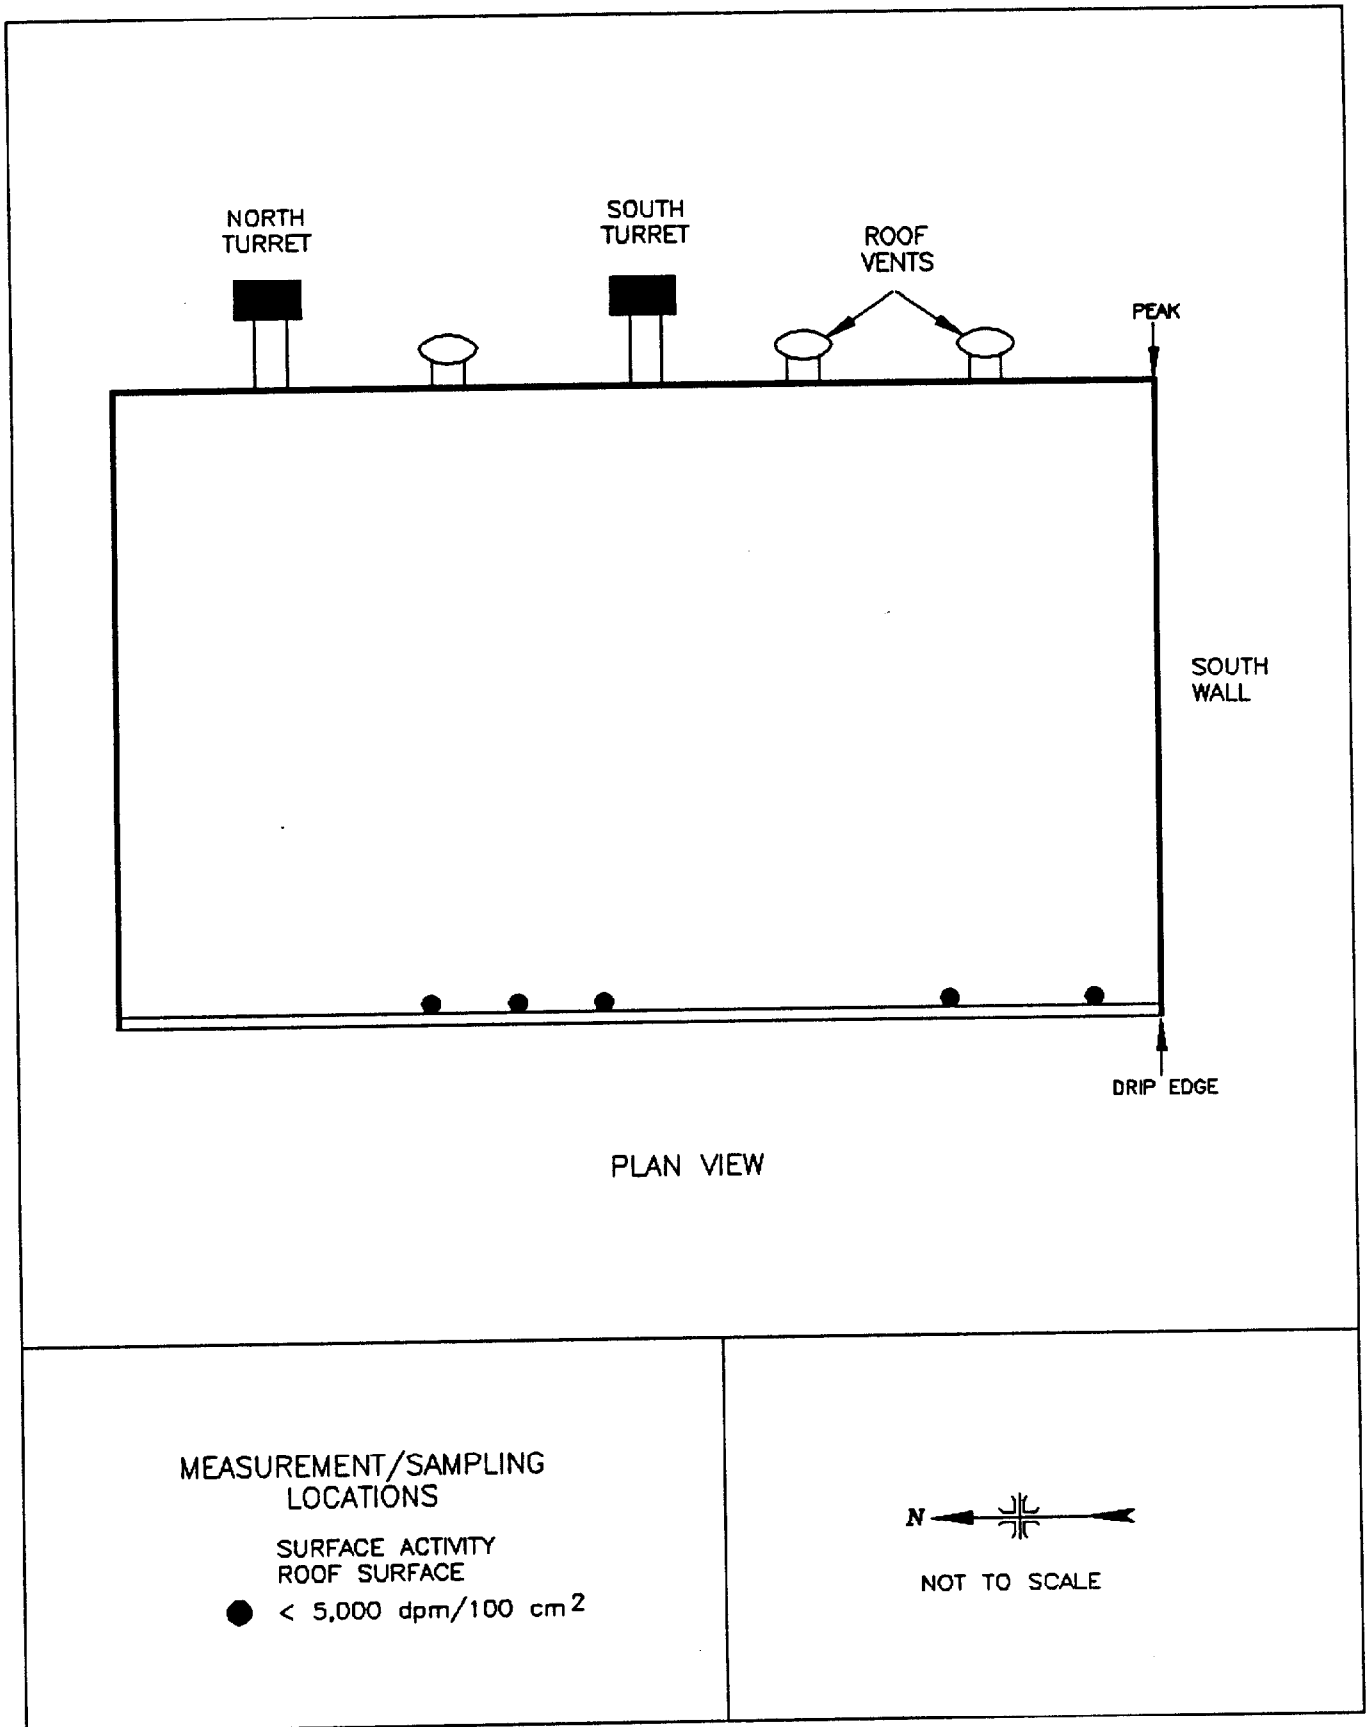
Building 3, West Roof – Measurement and Sampling Locations
